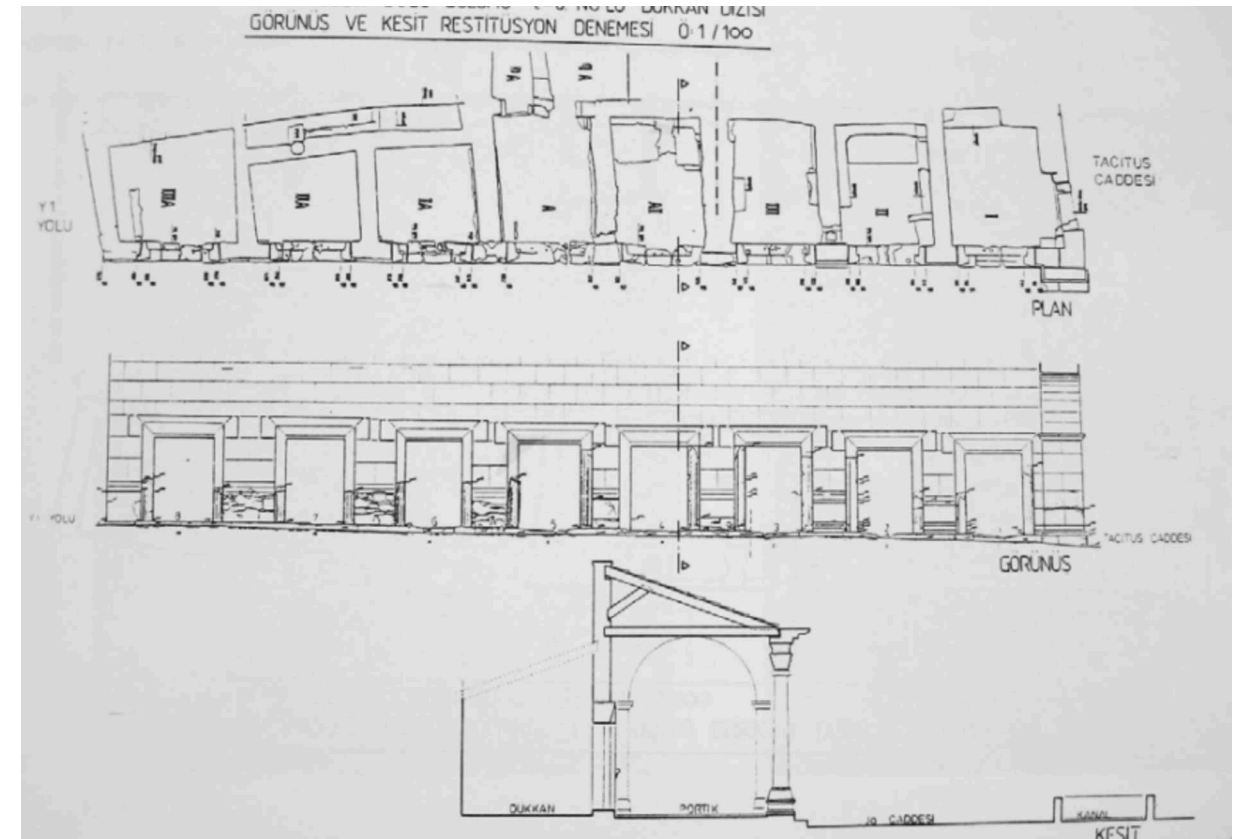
Restitution of elevation and section of the N-S street shop row/
